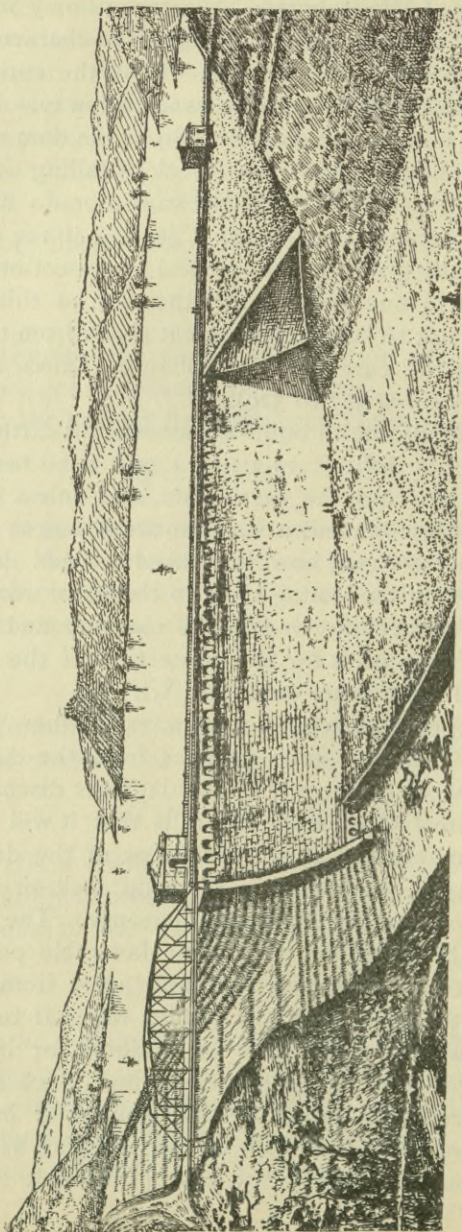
VIEW OF NEW CROTON DAM AND WASTEWAY.
